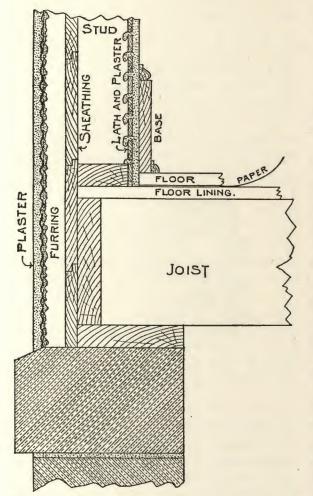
General details of construction of a cement plaster house. Section showing work at first floor level.
